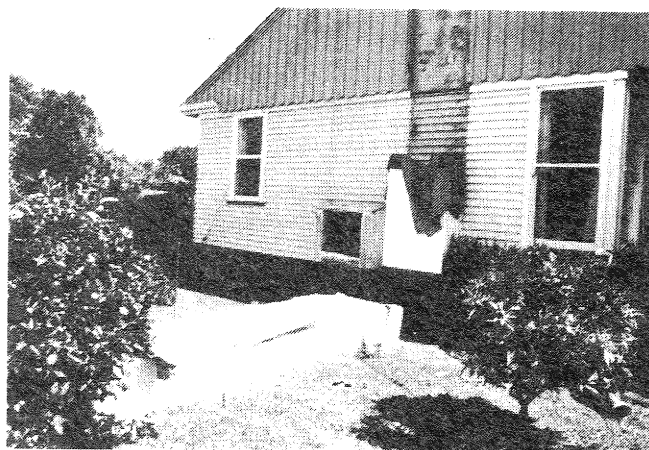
An unreinforced pumice concrete chimney
